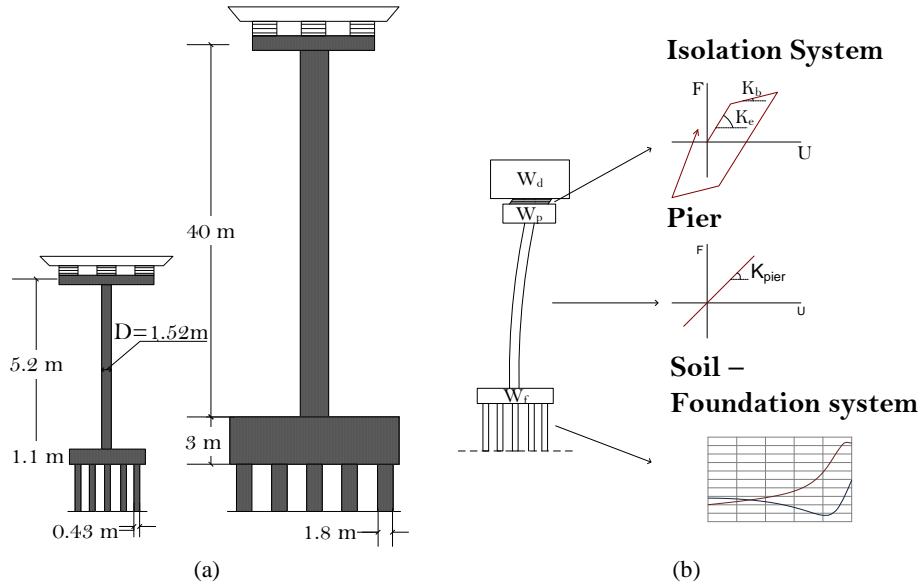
(a) Geometrical representation of Bridge I and Bridge II; (b) Mechanical modeling of bridge and foundation system
